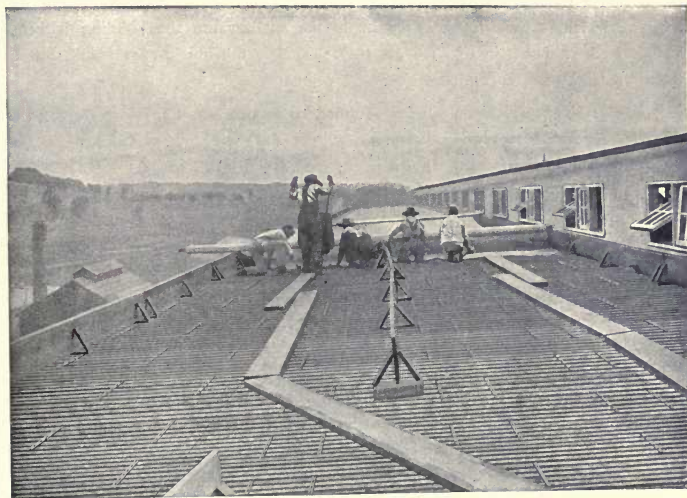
Placing of Ferroinclave Roof. (See p. 185.)
